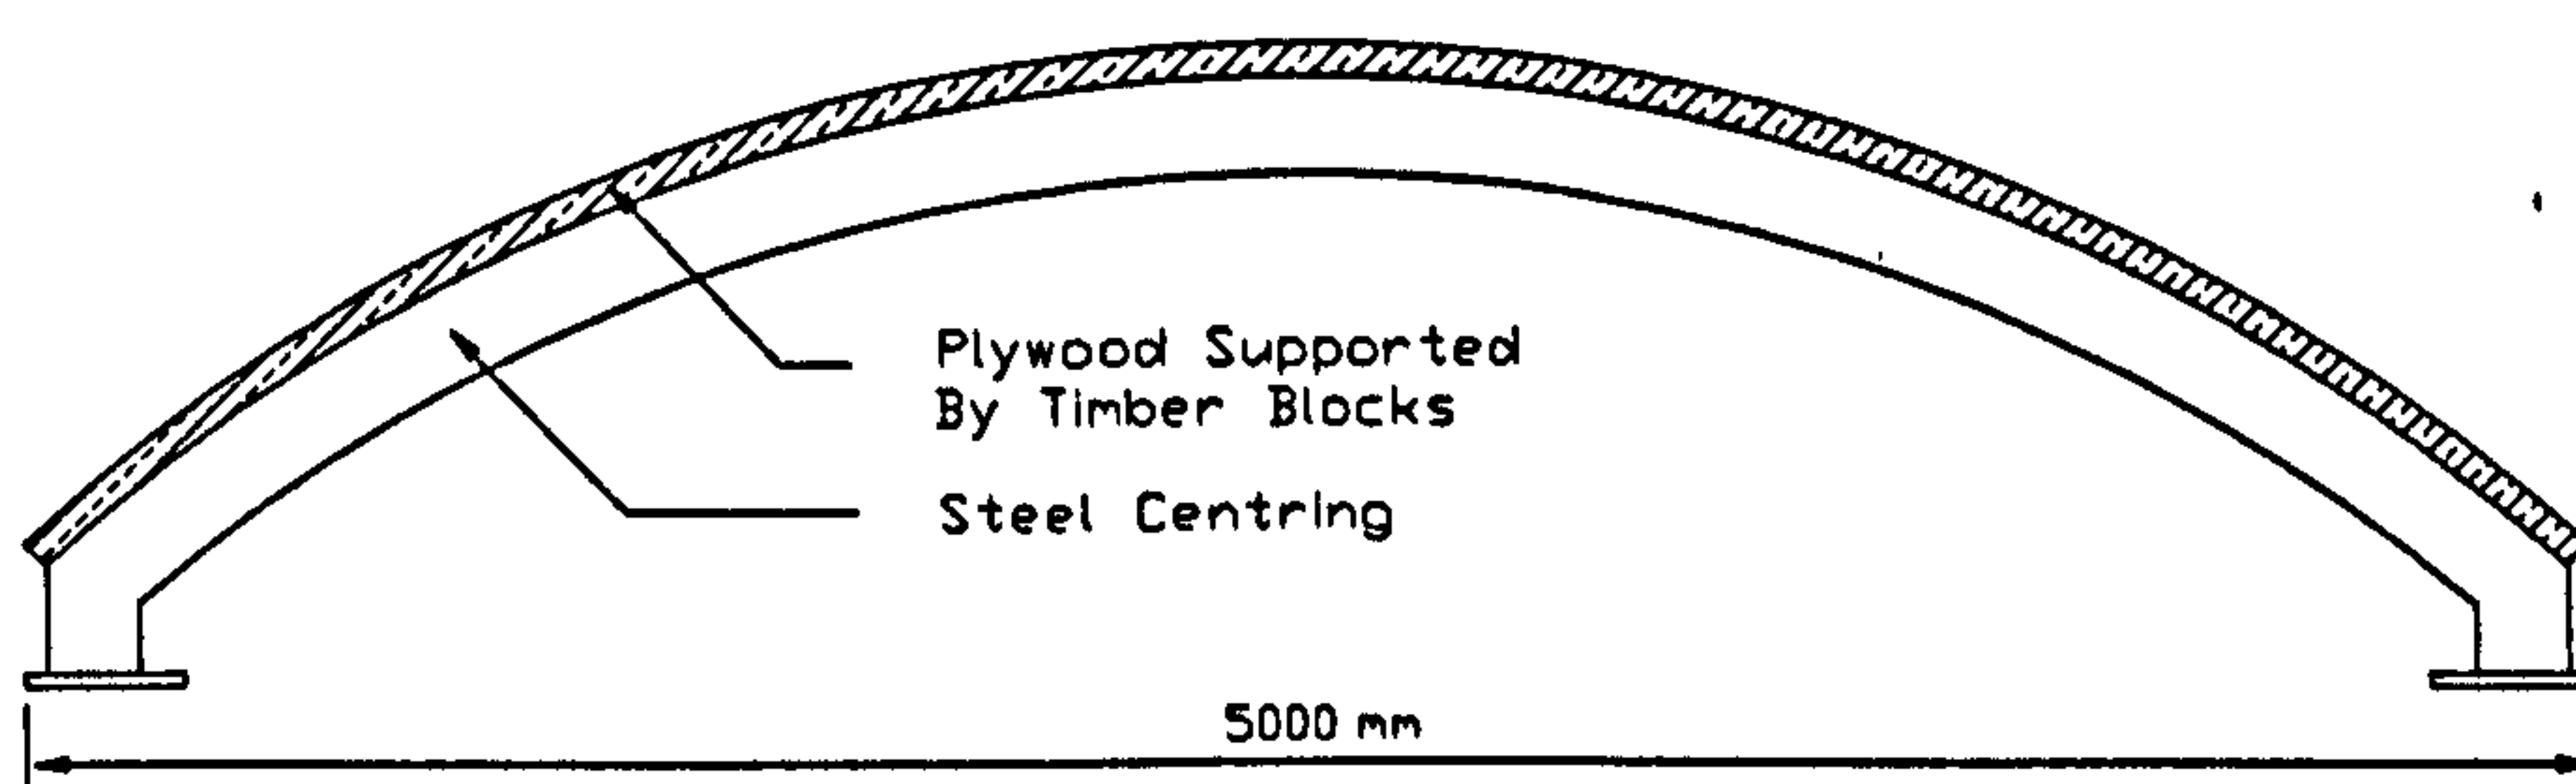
Centering For The Main Arch Construction of The OSBMAB
